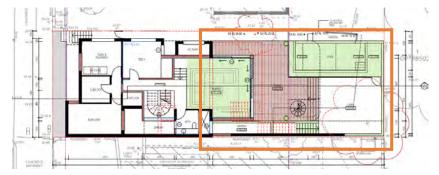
Working amended lower ground floor plans submitted 06/10/2022.
